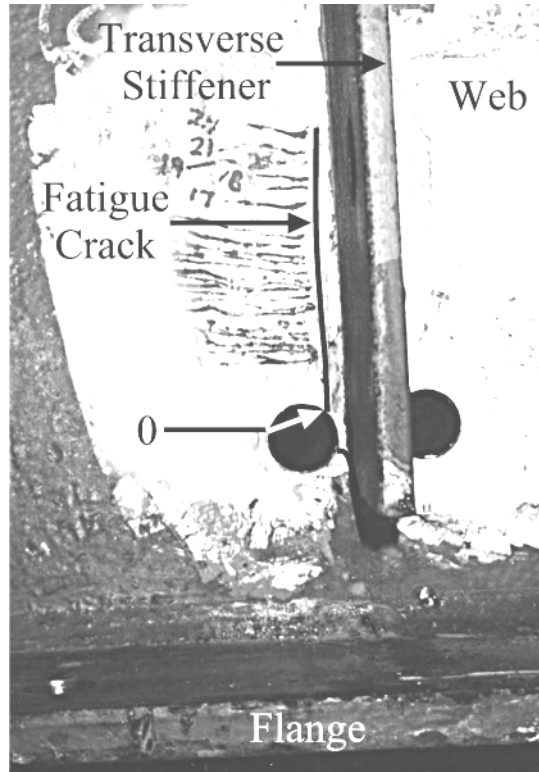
Fatigue Crack on West Face of Joint 10, Specimen 2
